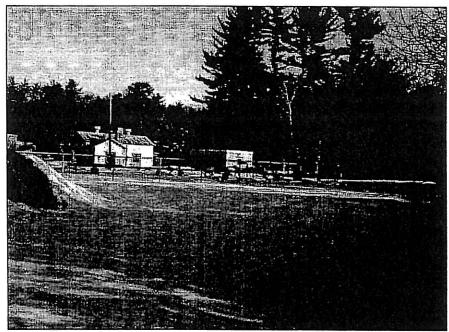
View of existing Laconia Meter Station and proposed additional temporary workspace (foreground), view facing northwest.
